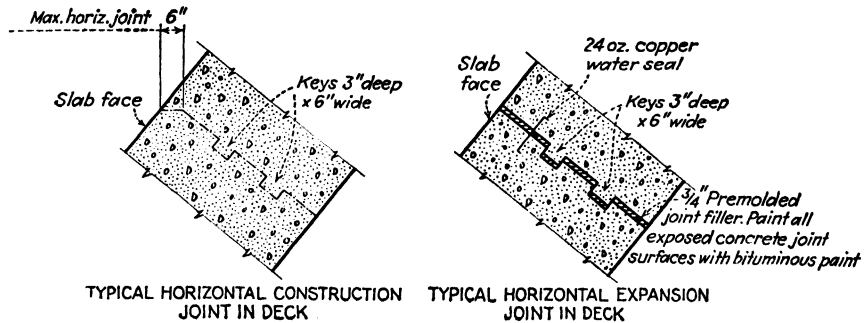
Possum Kingdom Dam. Typical horizontal construction and expansion joints.
